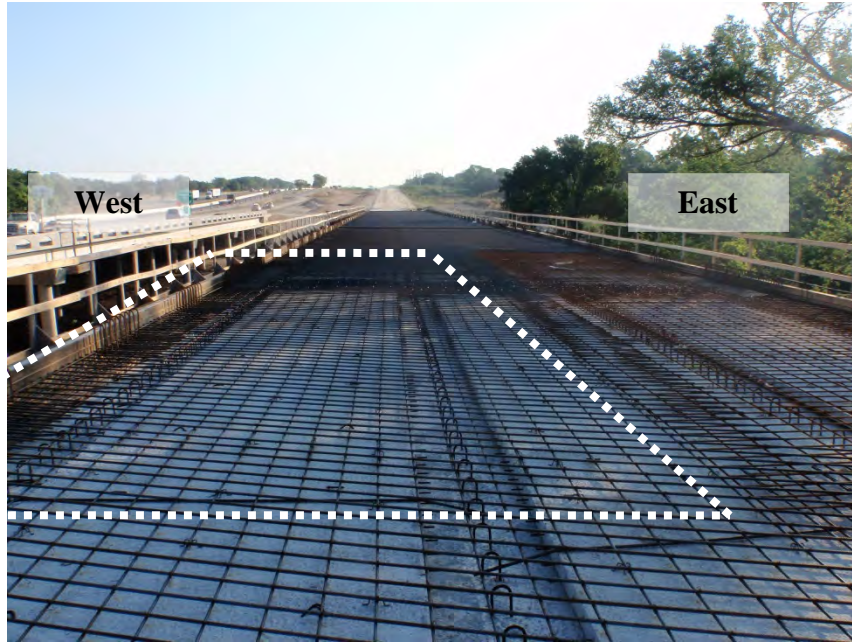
Test area for current TxDOT standard reinforcement, Lampapas River Bridge
